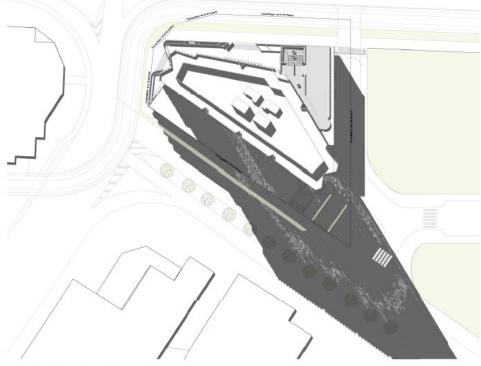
The proposed development together with nearby higher building forms (source: application plans prepared by Rothe Lowman)
